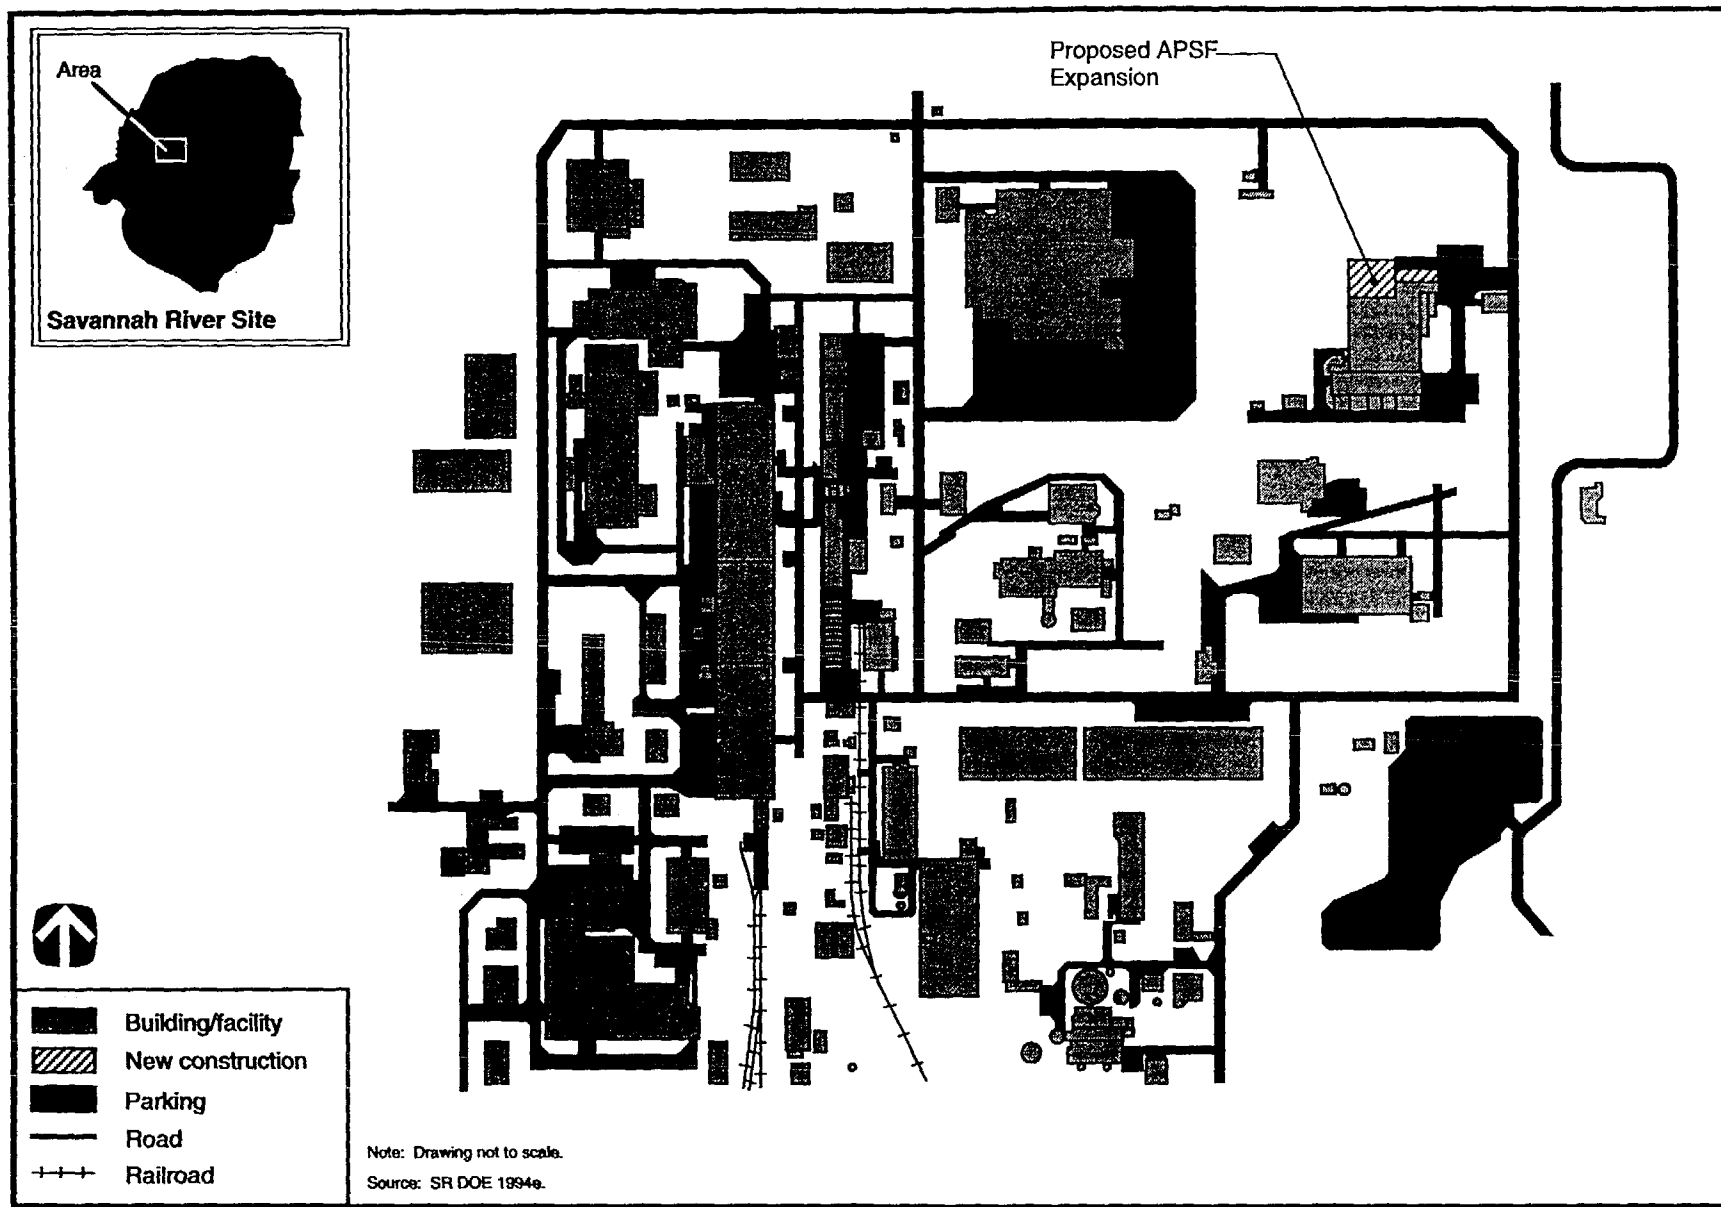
Proposed Plutonium Storage Upgrade at Savannah River Site F-Area (Plan View).
